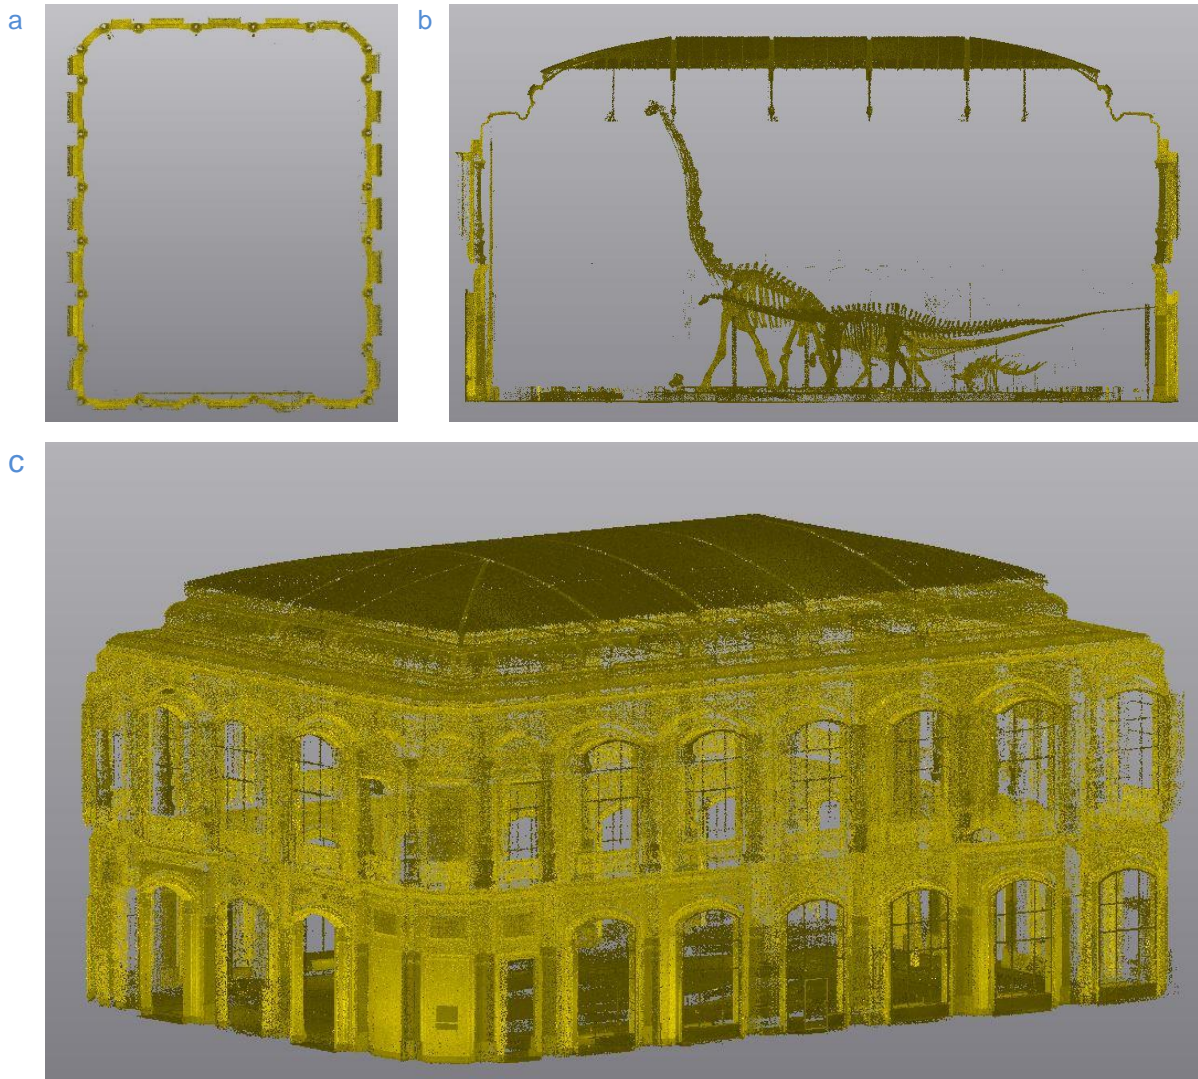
Figure after segmentation and cleaning the main hall, a- plan, b- section, c-perspective view. (By author)
